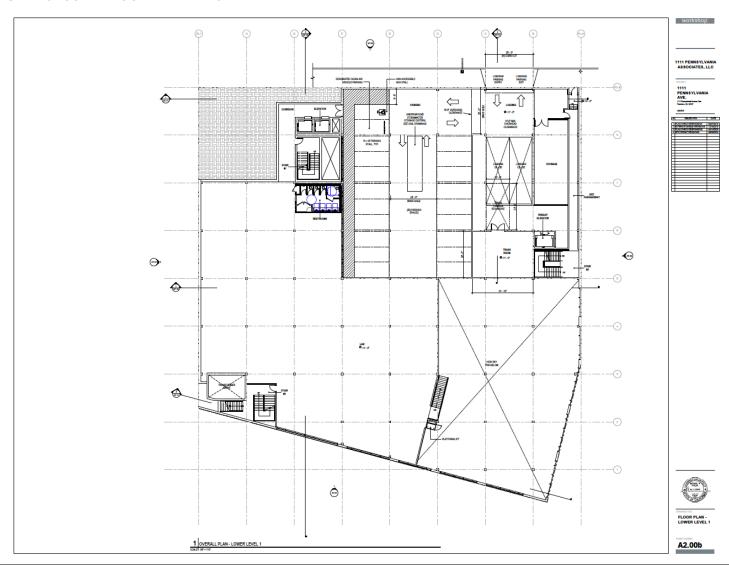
PROPOSED FLOOR PLAN - LEVEL 1
